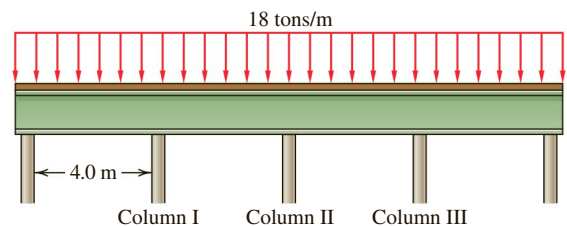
Dimensions for center truck joists and beamsFigure SA5.1.5 Row of columns in a cross-sectional view
